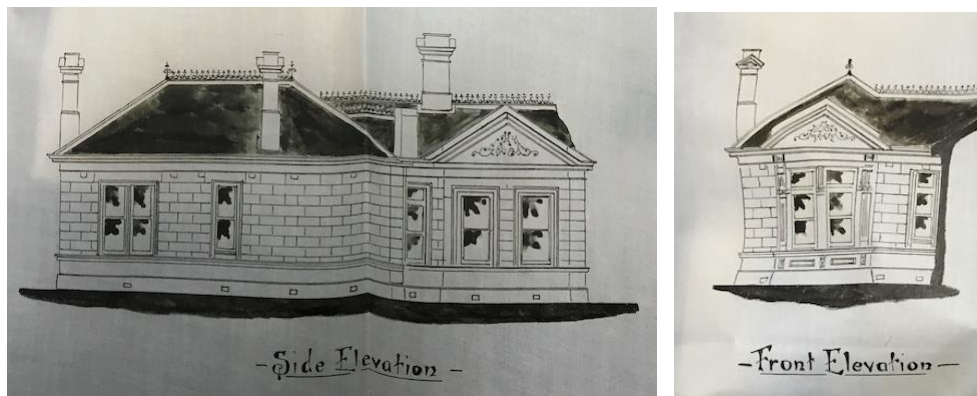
Extract of original building plans showing the additions to Talana in 1914
